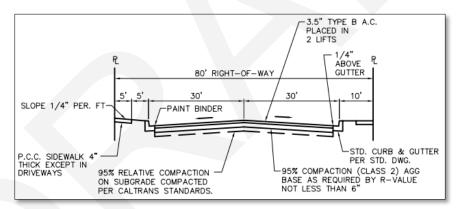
COLLECTOR STREET TYPICAL CROSS-SECTION
